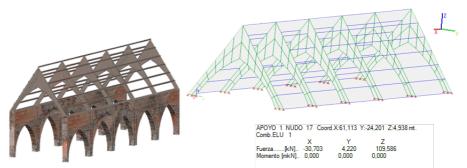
a) Design proposal for a new roof made with glued laminated wood; b) Tension analysis in the new roof supports.
